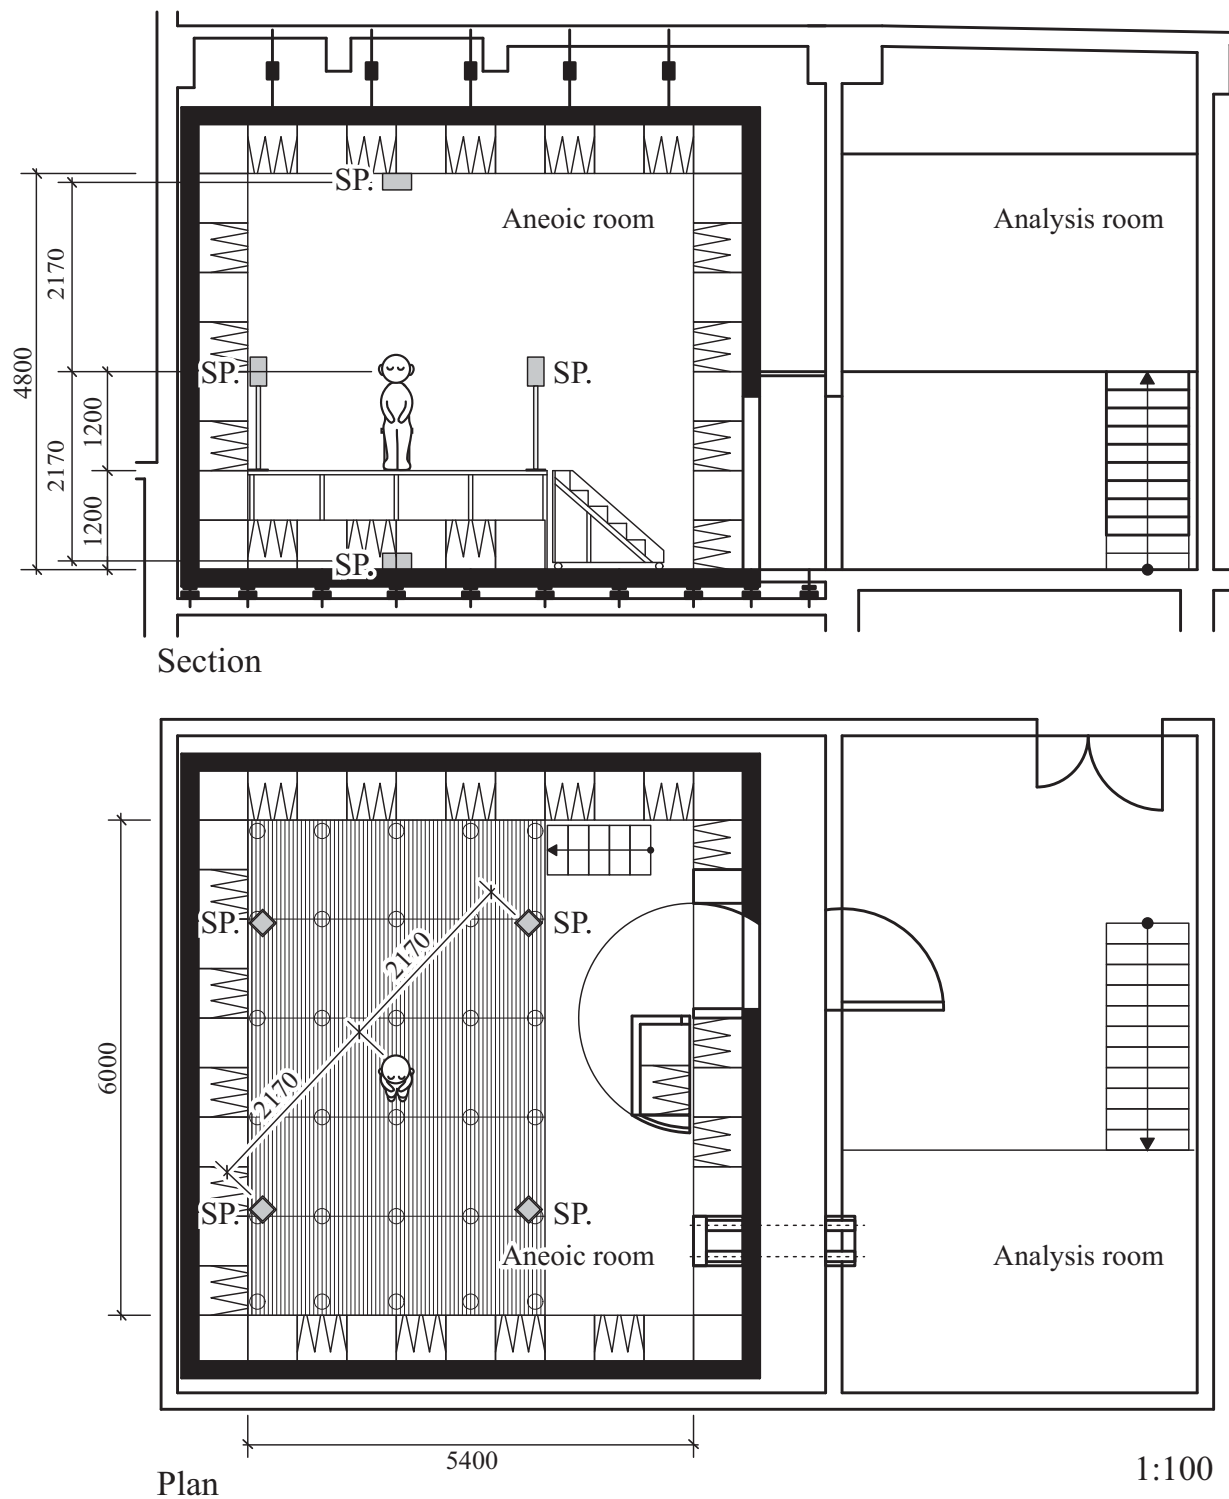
A plan of anechoic room and an arrangement of speakers.
